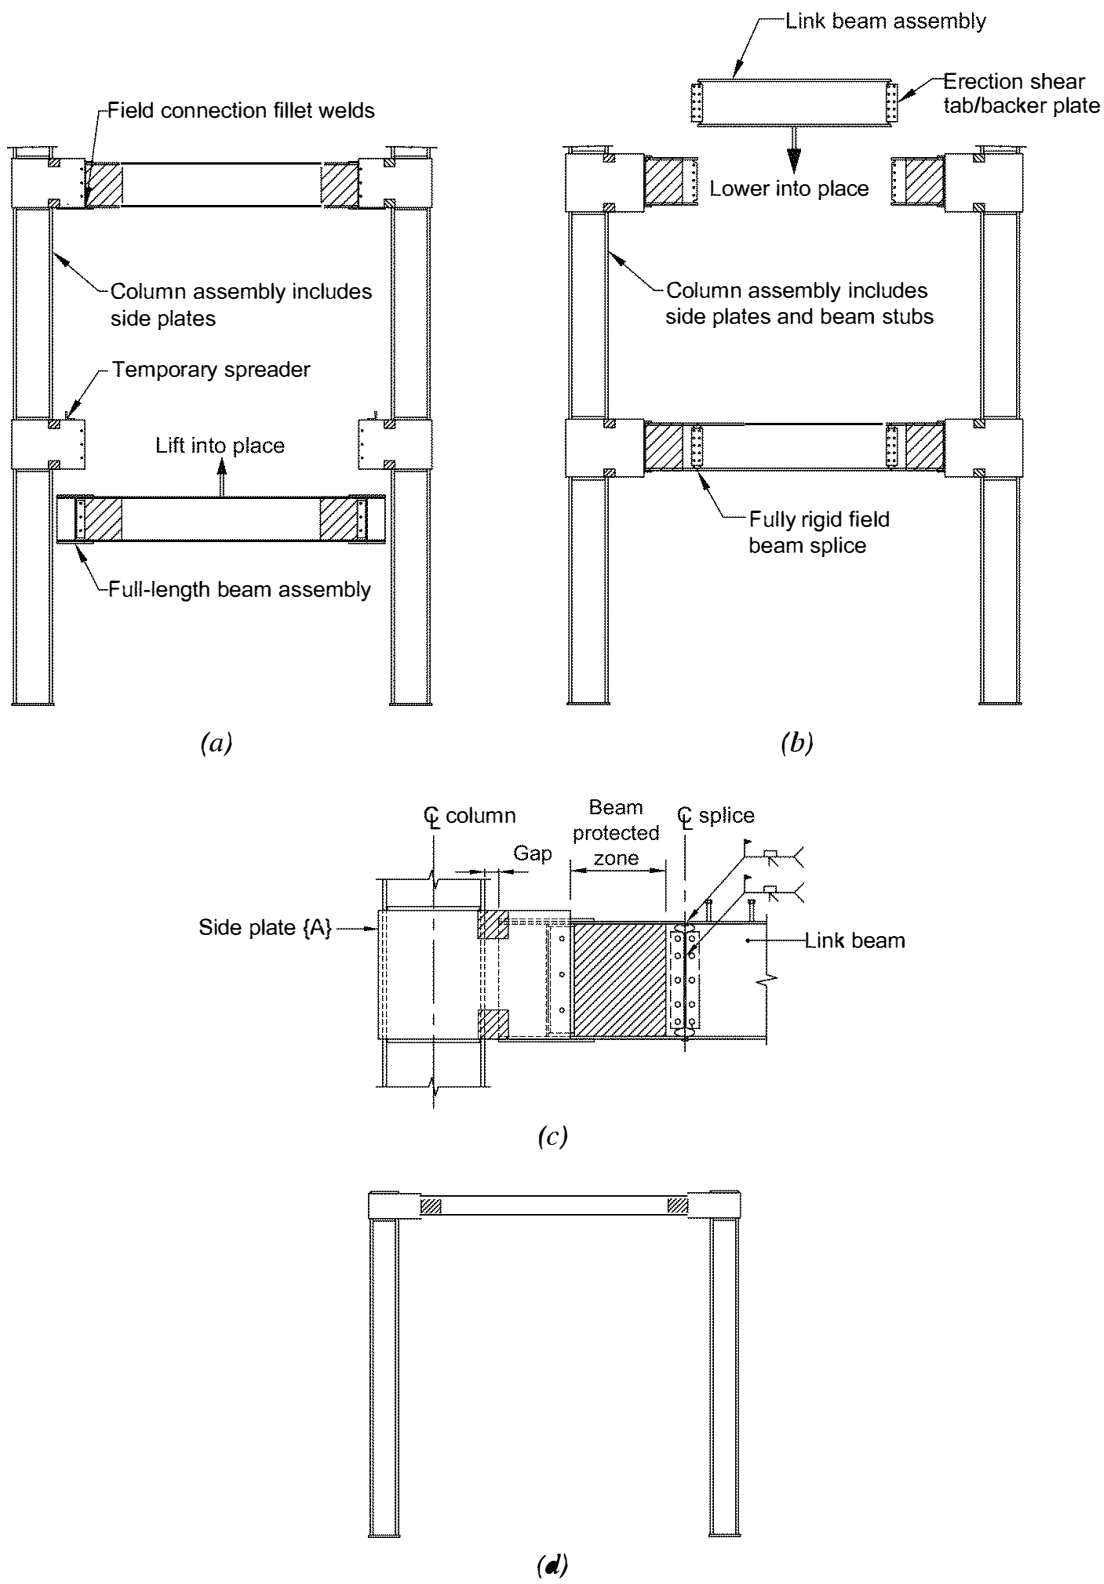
SidePlate construction methods: (a) full-length beam erection method (SidePlate FRAME configuration); (b) link-beam erection method (original SidePlate configuration); (c) link beam-to-beam stub splice detail; and (d) all shop-prefabricated single-story moment frame (no field welding); multi-story frames are dependent on transportation capabilities.
